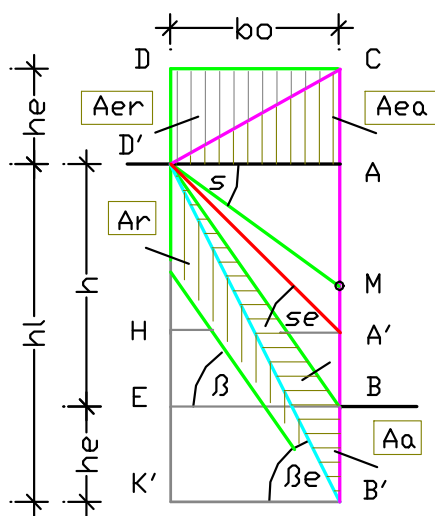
Earth block with rectangular load area and its inclination and shear planes without / with load.
